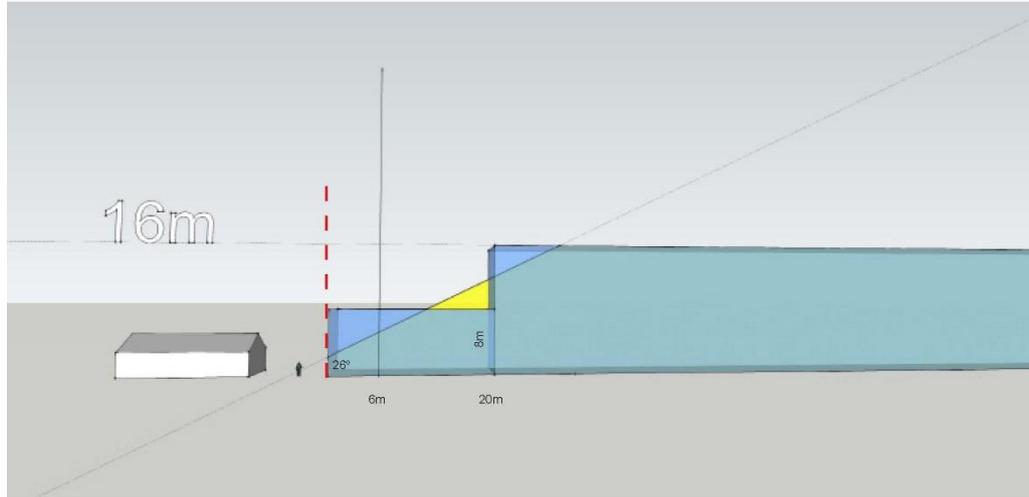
North Boundary Ilam Rd to Waimairi Road
